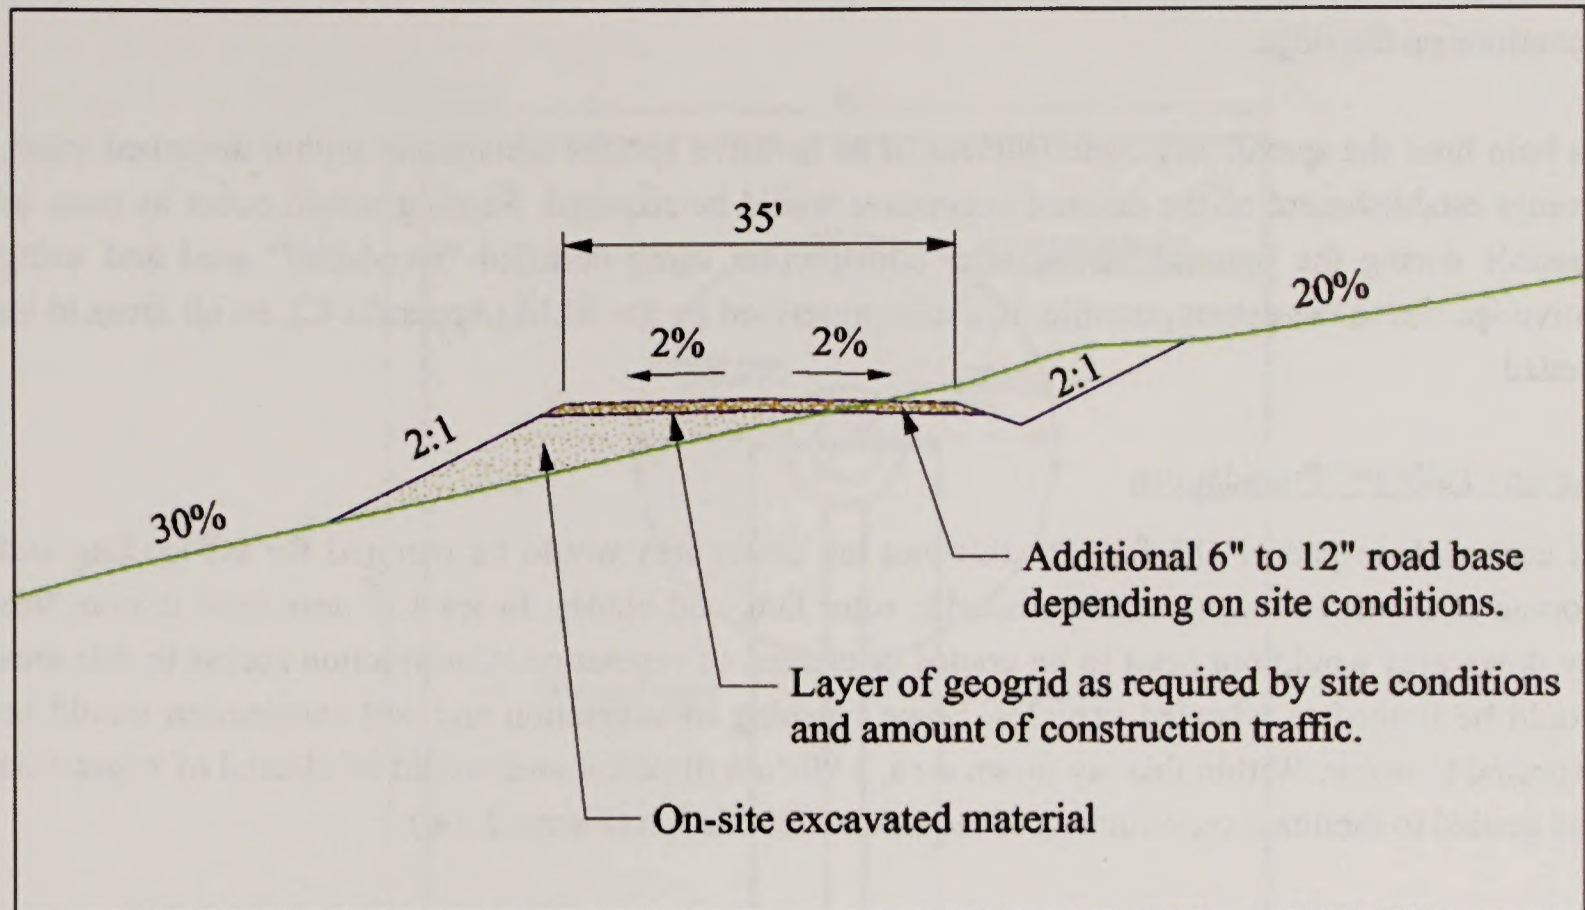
Typical Cross Section for Project Turbine String Roads.
